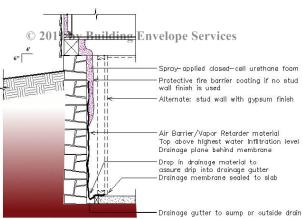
AVID installation and diagram (© 2011 by Building Envelope Services; reprinted with permission)
